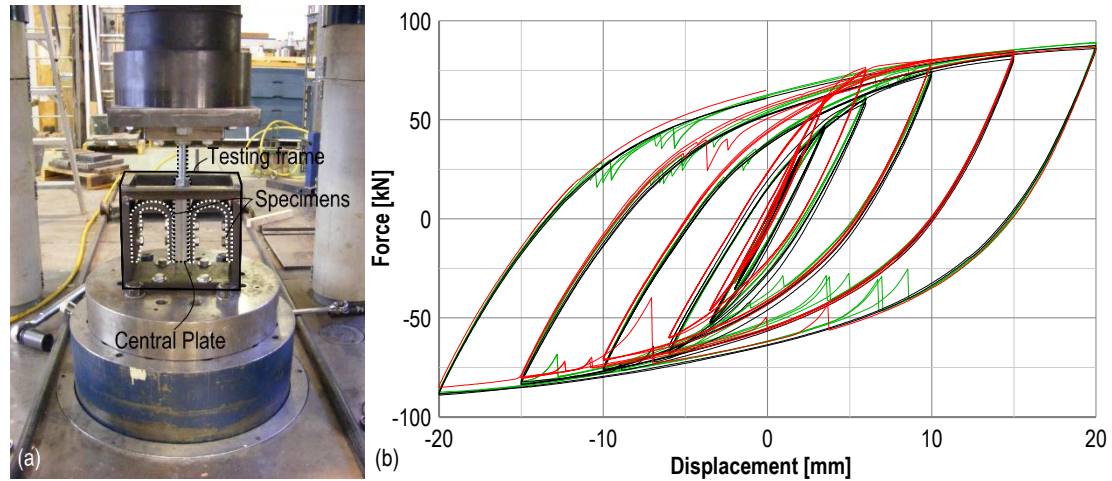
(a) Component testing test setup; (b) U-shaped Flexural Plates force-displacement loop.
